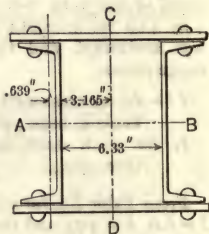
Moment of Inertia of Cross-section of Plate-and-channel Box Column
